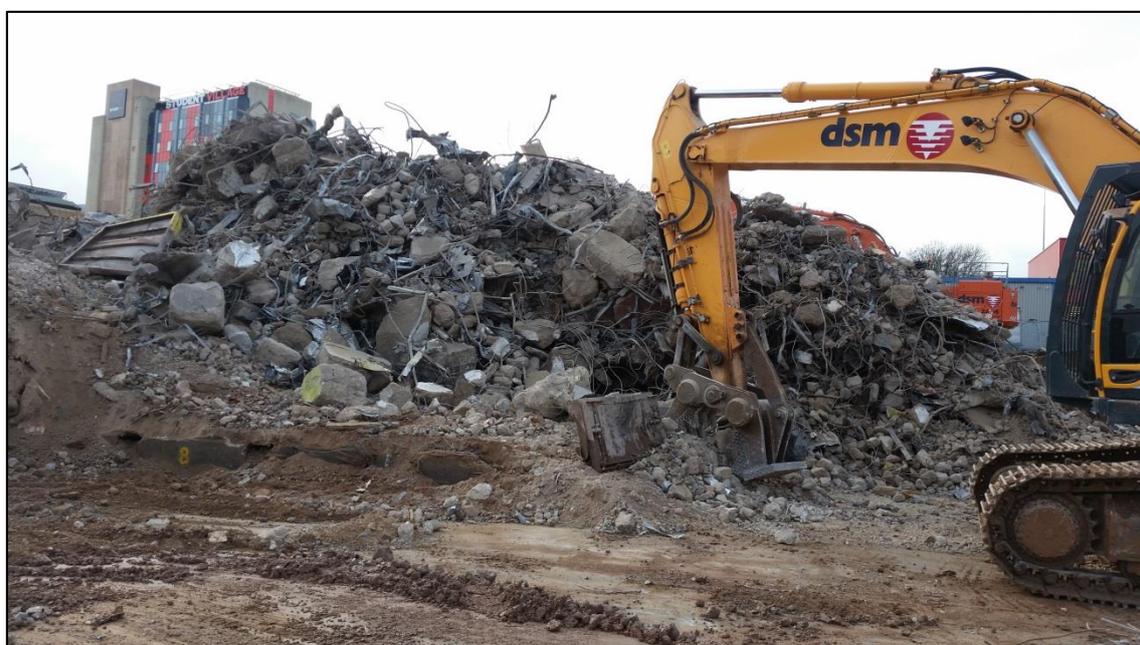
Segregated sections of CCA from demolition sites in the East and West Midlands, UK
